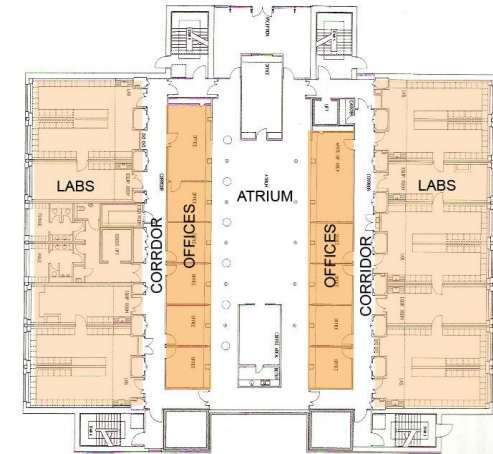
Typical Floor Plan of Institute of Medical Science with 2 wings of labs each with offices overlooking an atrium (Griffin 2000: 158).
